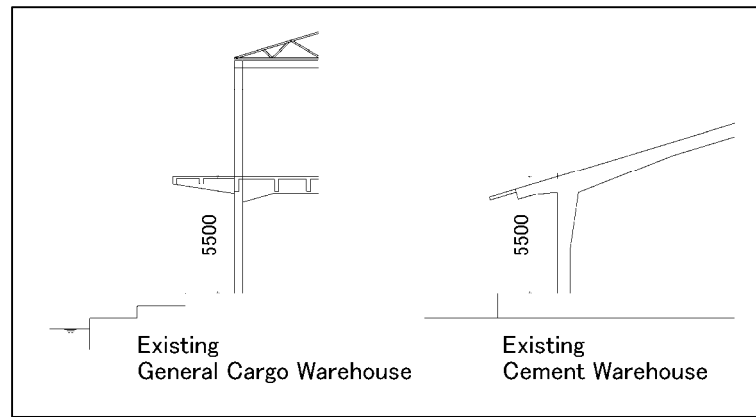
Floor Height of Existing General Cargo and Cement Warehouse
